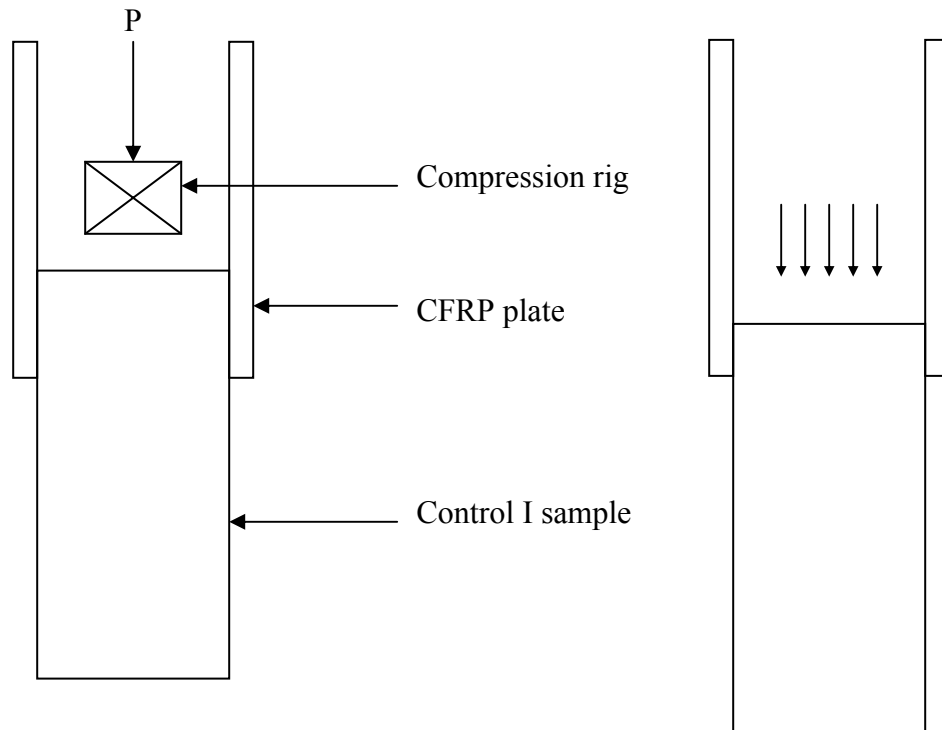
(a): Compressive load acting on 50% on top of concrete prism surface for sample Control I
